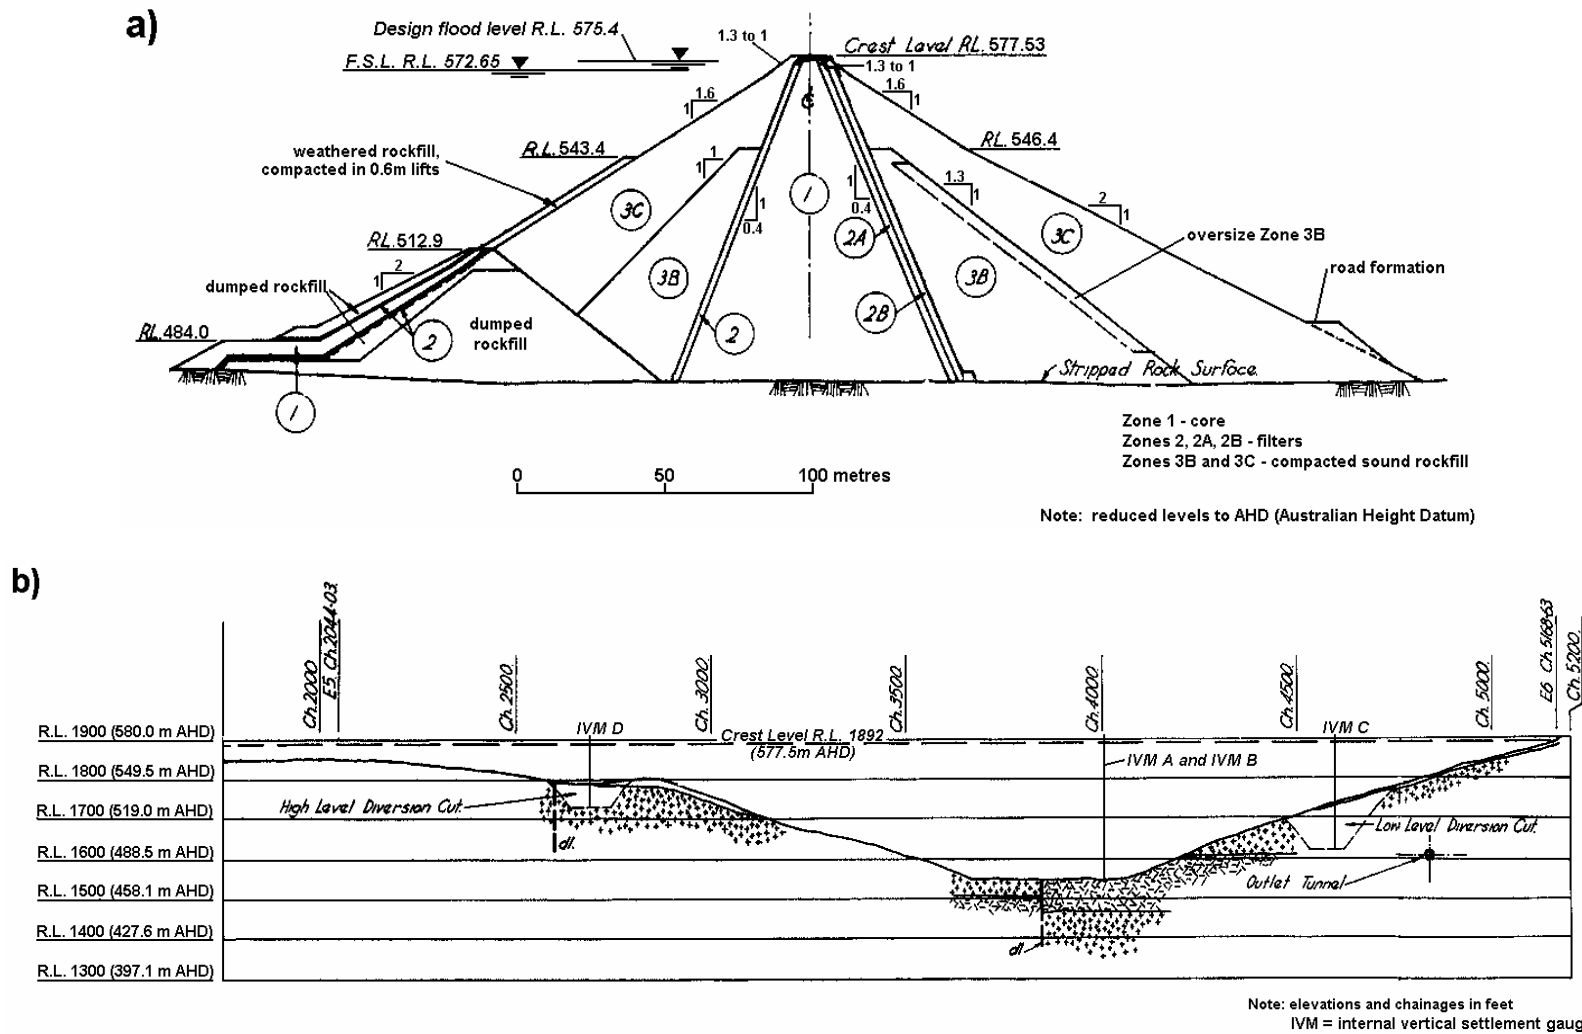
Copeton dam; (a) maximum section and (b) long section on the embankment centreline (courtesy of New South Wales Department of Land and Water Conservation).
